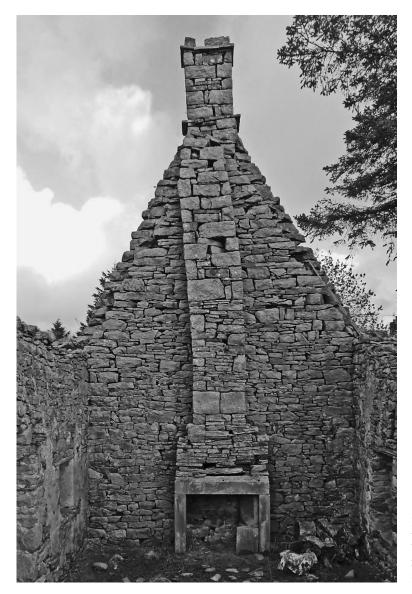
The steep gable wall of ruin behind Whitehouse, Featherstone: now sadly a dangerous structure.
